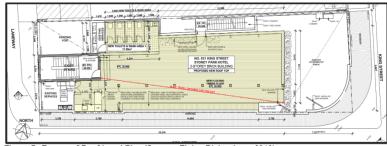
Figure B: Extract of Roof Level Plan (Source: Elaine Richardson, 2019)
